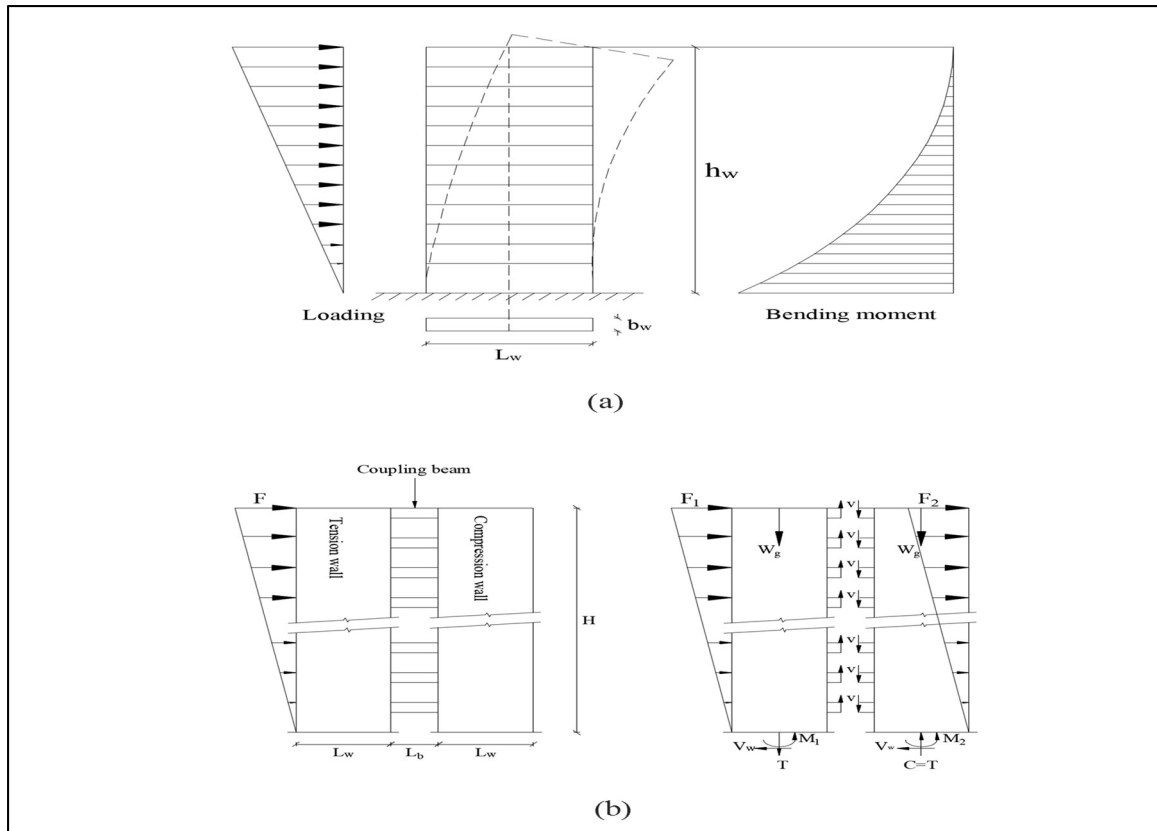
Shear walls under lateral load: a) single shear wall, b) coupled shear walls
